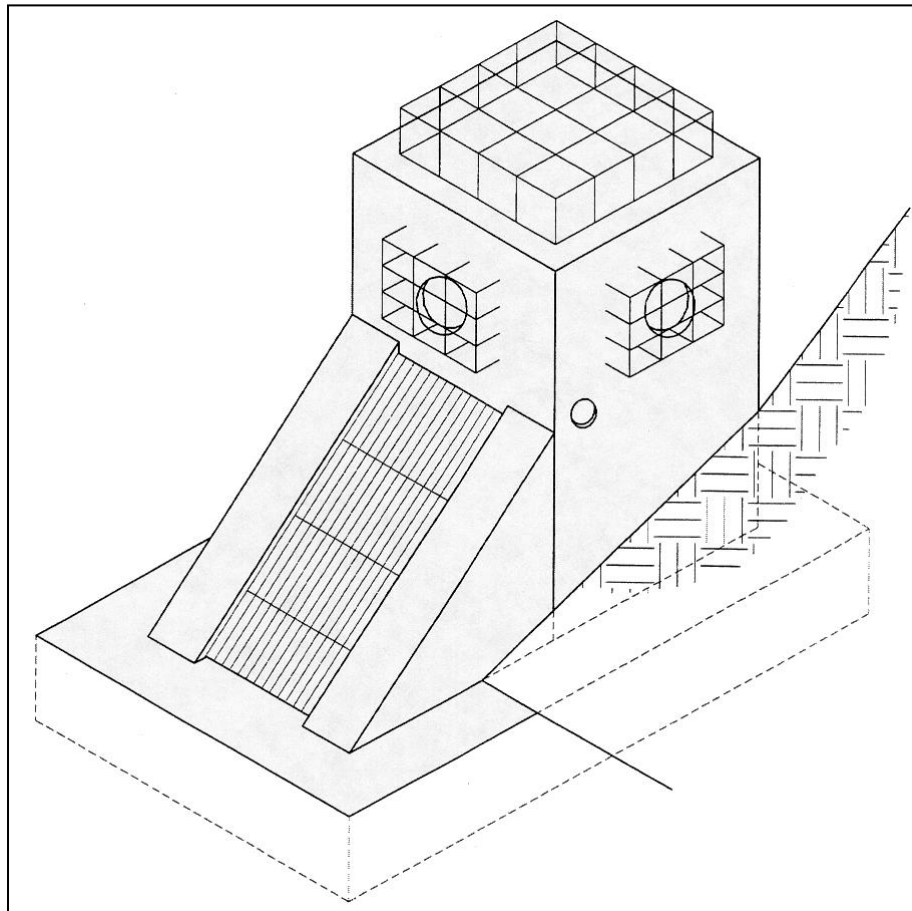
Example of Various Trash Racks Used on a Riser Outlet Structure
